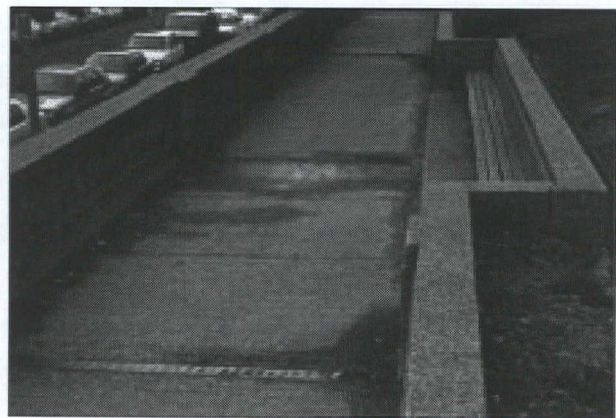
Wood slat benches with no backs at recesses in the retaining wall above W Street at the southern end of the park, 1997, see plan sheet 35 (Land Ethics, Inc.).
